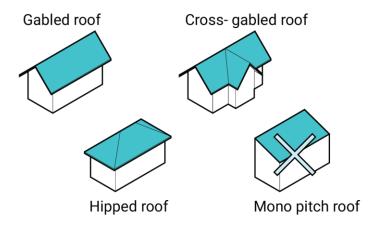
(B)(3)(e)(ii): Roof types — VMU District
